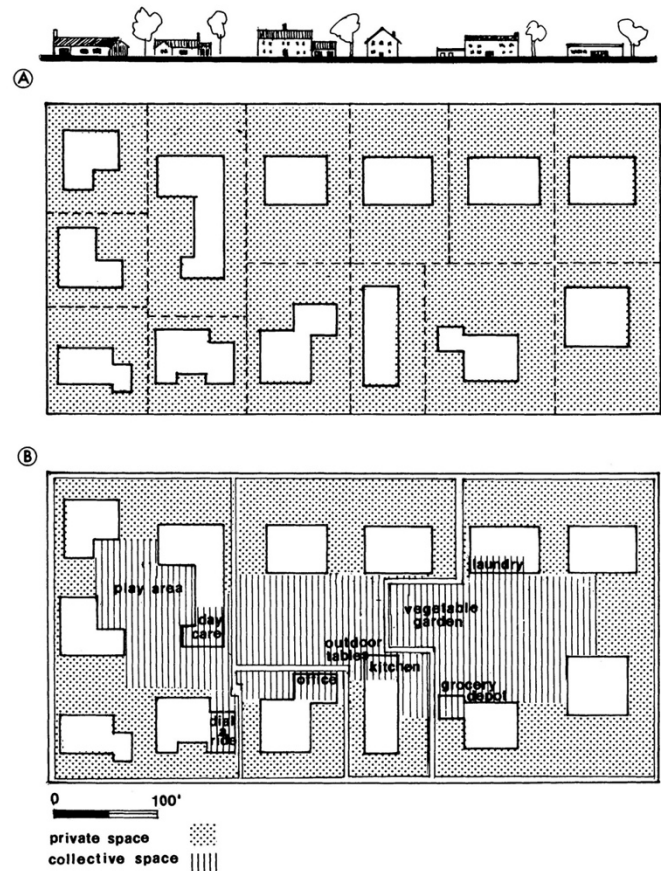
A, Suburban neighborhood, block plan. B, Proposed HOMES revitalization, same suburban block with new common space and facilities.
